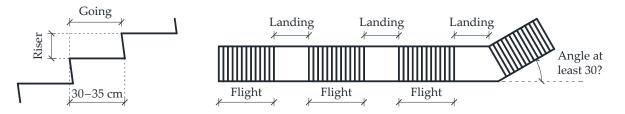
Public stairs adopted from CD 353 ((left): cross section; (right): in-plane arrangement) [5].
